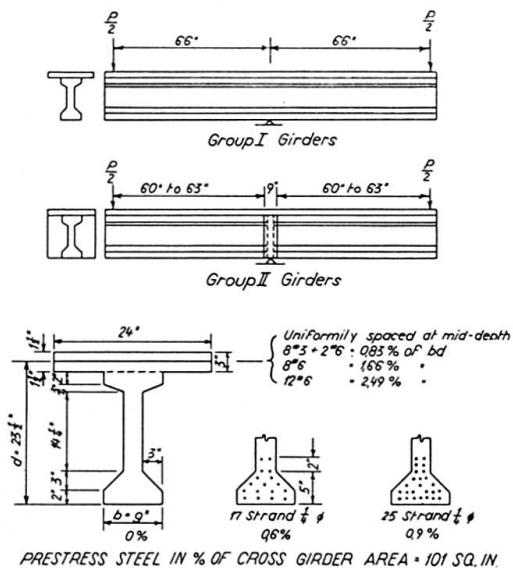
Cross-Sections and Loading Arrangements of Test Specimens in Stage I.
